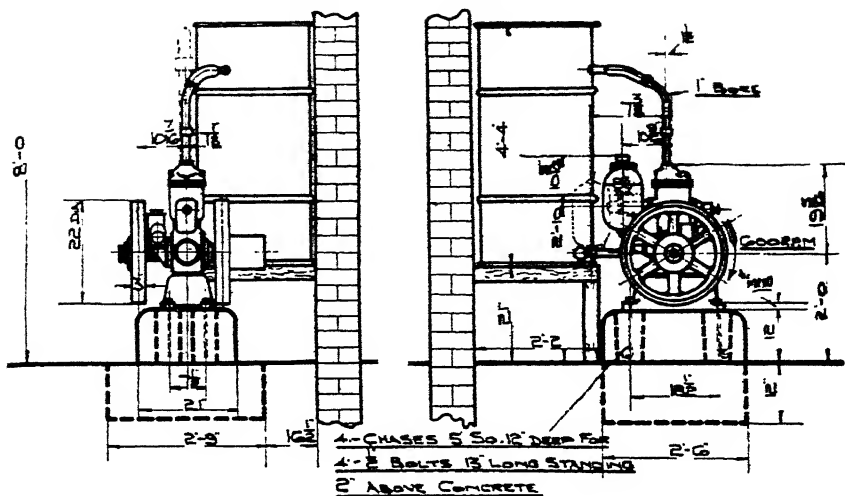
TYPICAL INSTALLATION DRAWING OF 5 B.H.P. PETROL ENGINE—SIDE AND END ELEVATION
